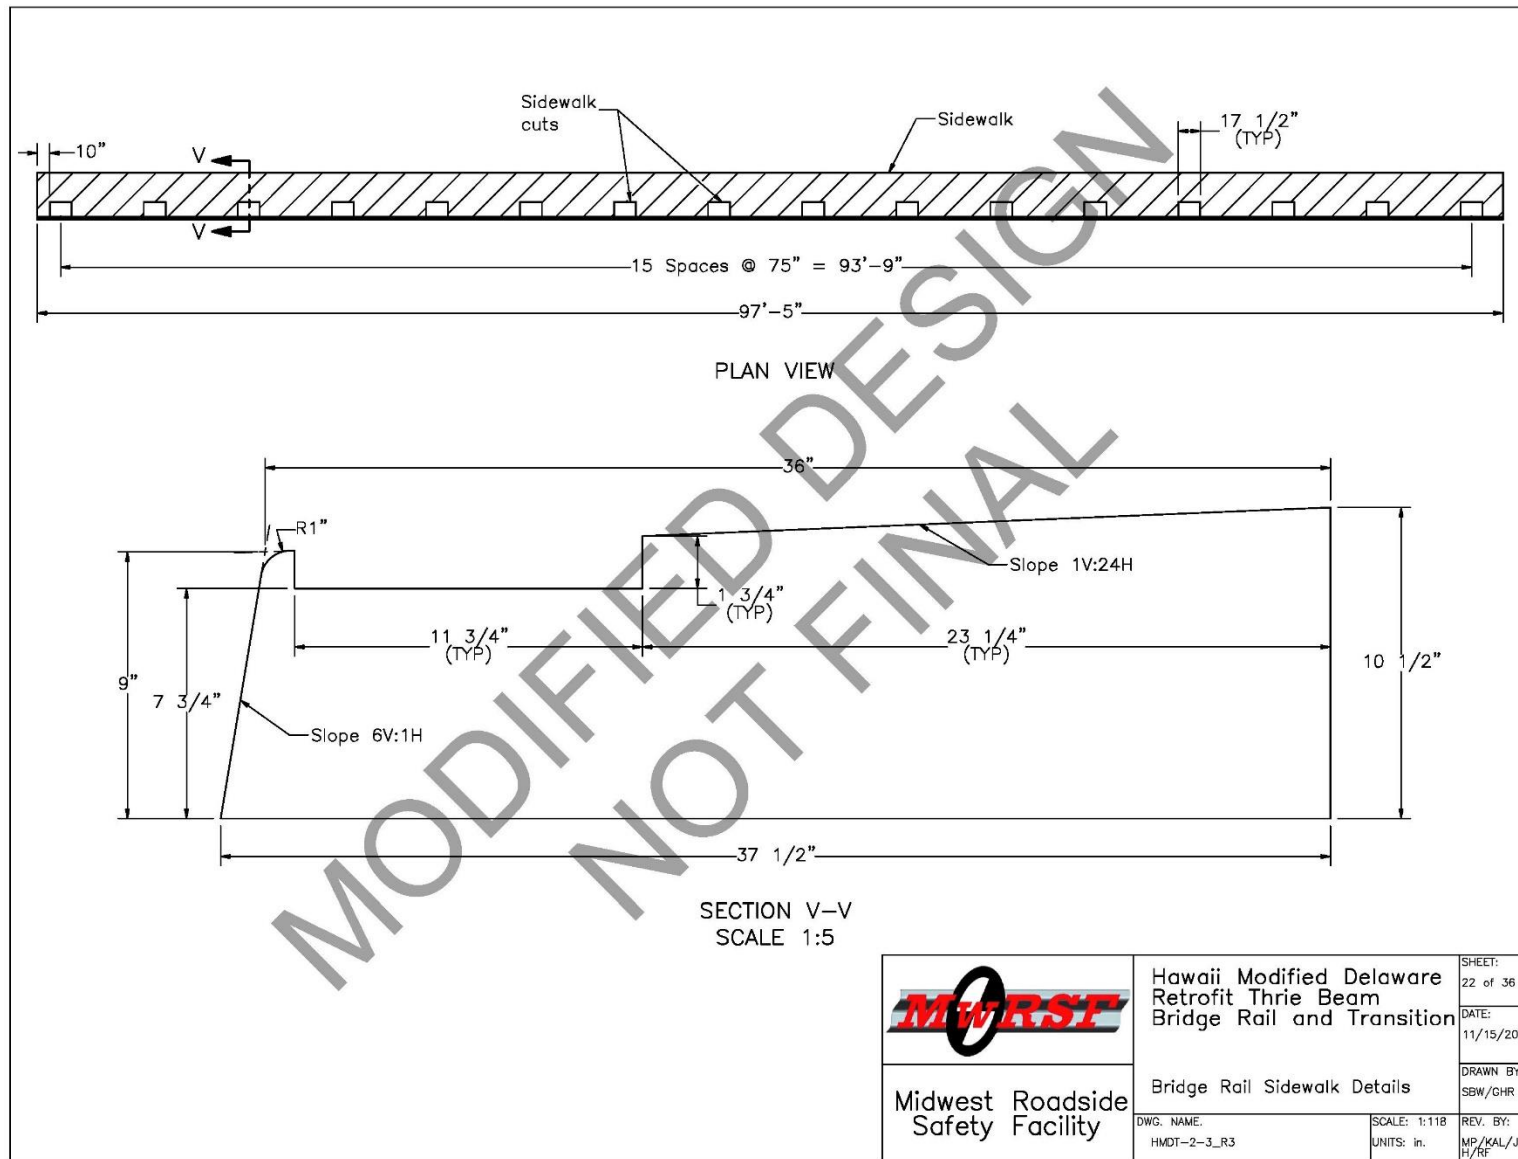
Bridge Rail Sidewalk Details, Test Nos. HMDT-2 and HMDT-3
